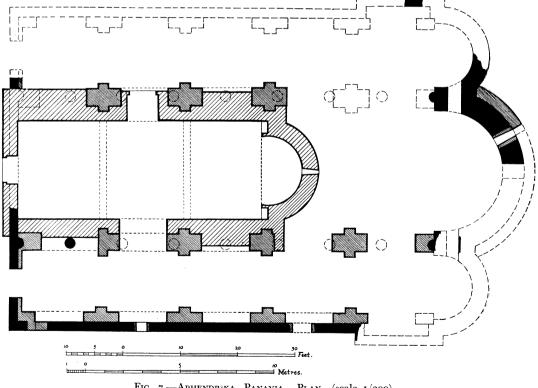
Aphendrika, Panayia. Plan (scale 1/200).
